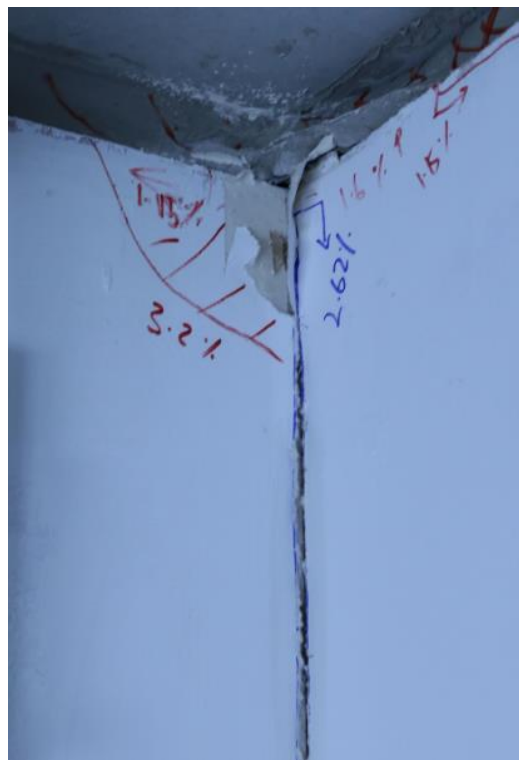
Specimen A2 - Step 14 – DS1b: paper tape detaching and plaster cracking – location 11
